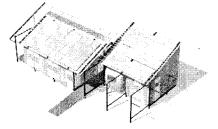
Solar PV panels on metal roofing deck with Hardie board over Structural Insulated Panels for wall infill.
